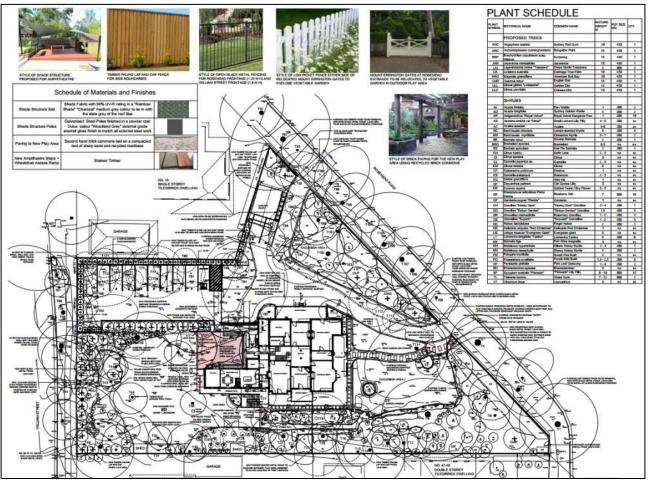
Landscaping plan for the proposal (Fiona Cole Design, 2020)
